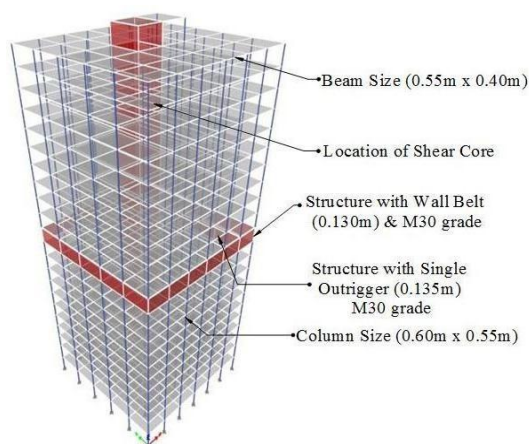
Case OTS6: Single Outrigger and Wall Belt Supported System at F1 with Dual Core
